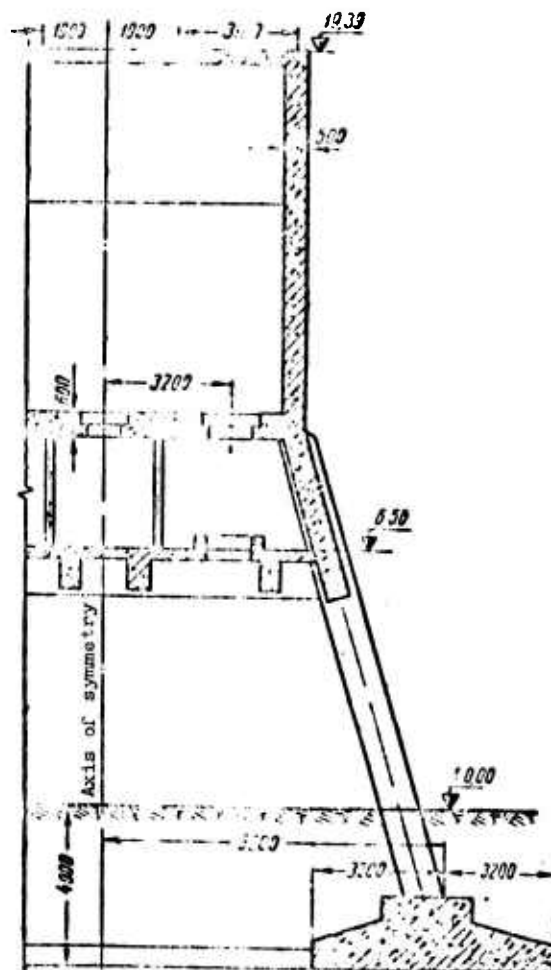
Receiving skip storage-type hopper; longitudinal section.
